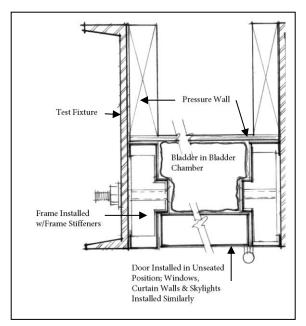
Horizontal Section thru Mounted Test Specimen & Bladder Chamber
